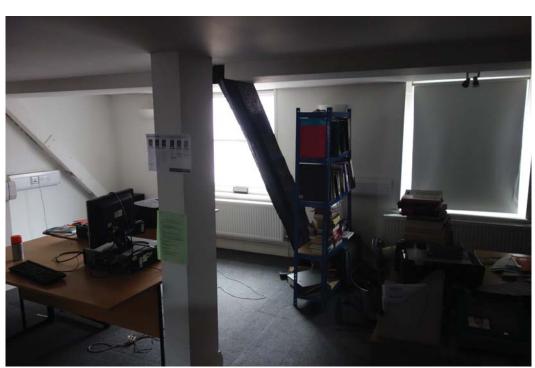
view looking north-east twards the blocked fireplace on the second floor front office
